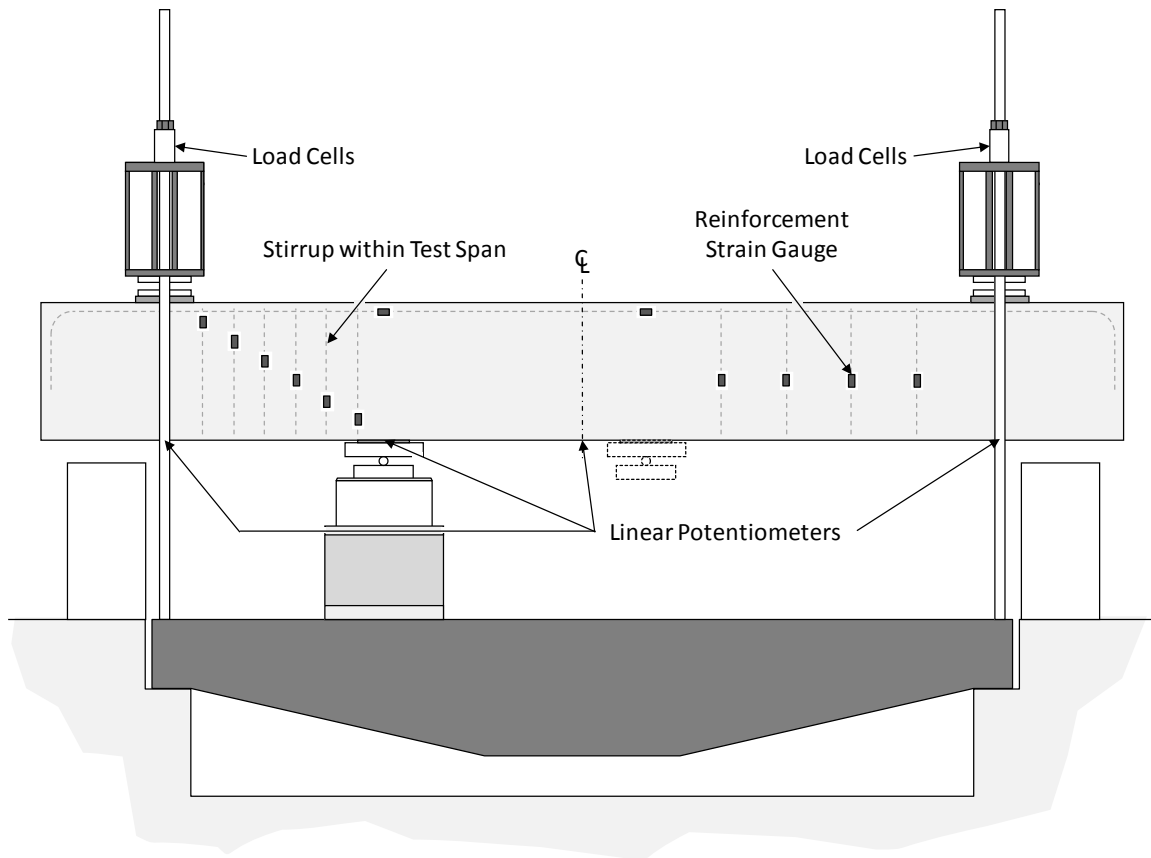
Large-Scale Beam Test Facility with Instrumentation Layout for Pilot Test
